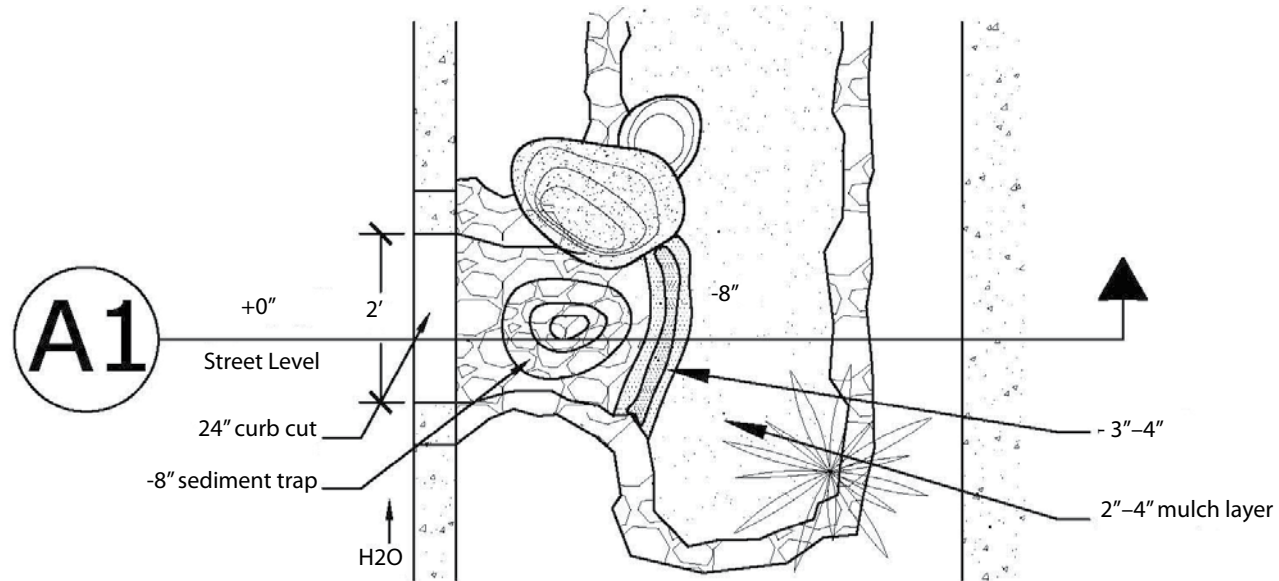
Plan view of sediment trap for curb cut with rock-lined basin.
